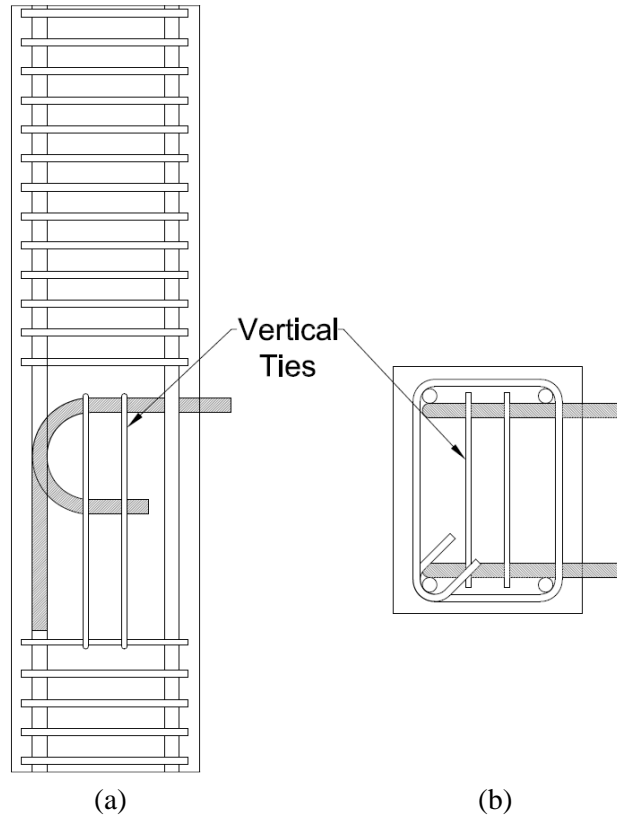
Details of specimen with vertical ties (a) side view and (b) cross-section
